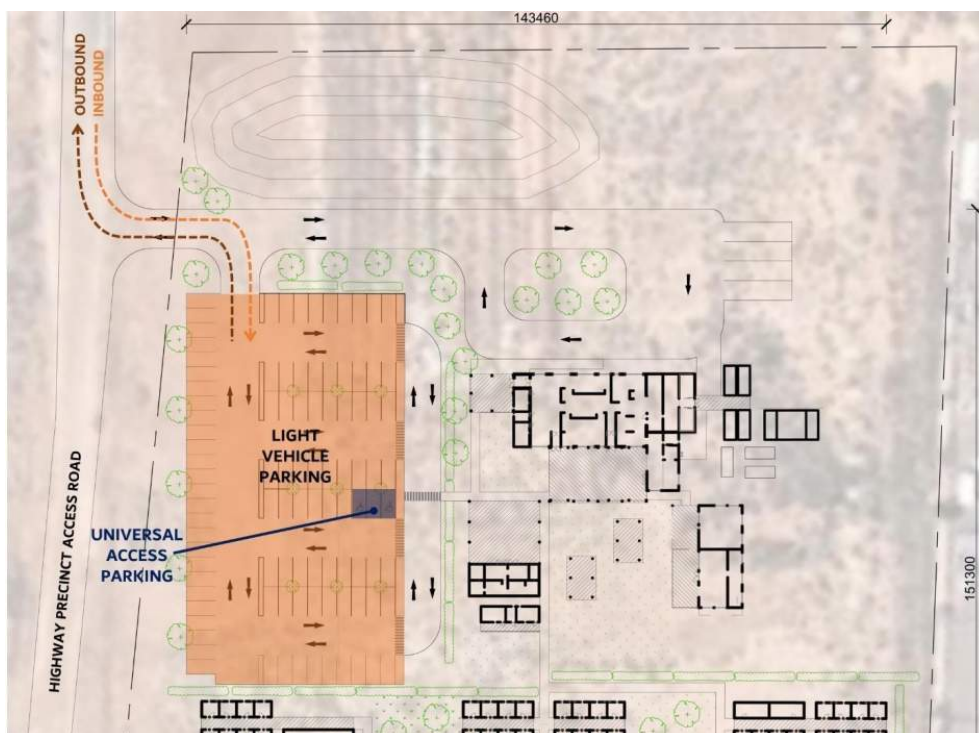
Proposed light vehicle movements into and out from the site (base plan source: Grounded, 2022)
